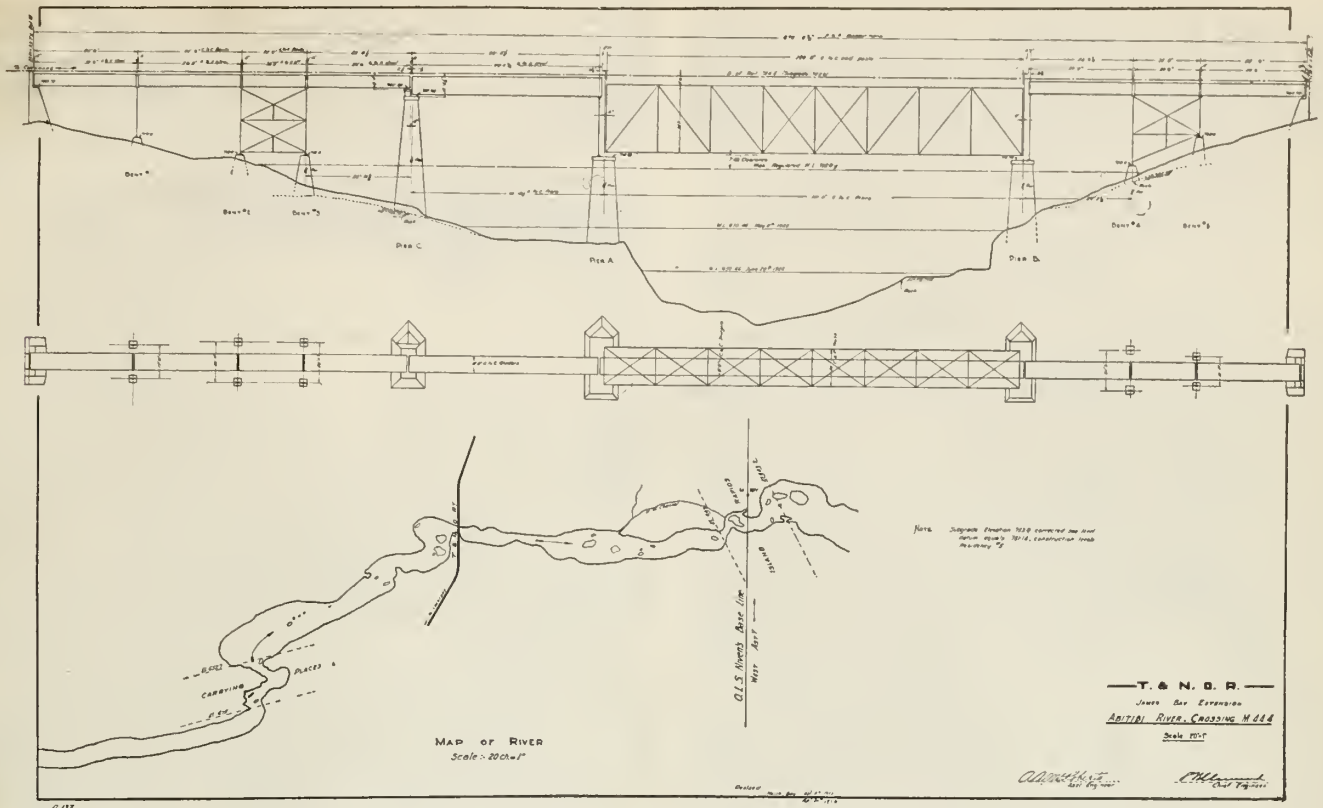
Plan of Bridge Second Abitibi River Crossing, T. & N.O. Ry.
